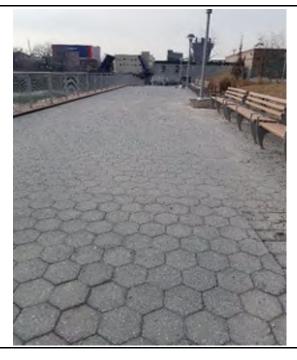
Paved southern esplanade area, facing southwest. 27 February 2019.
